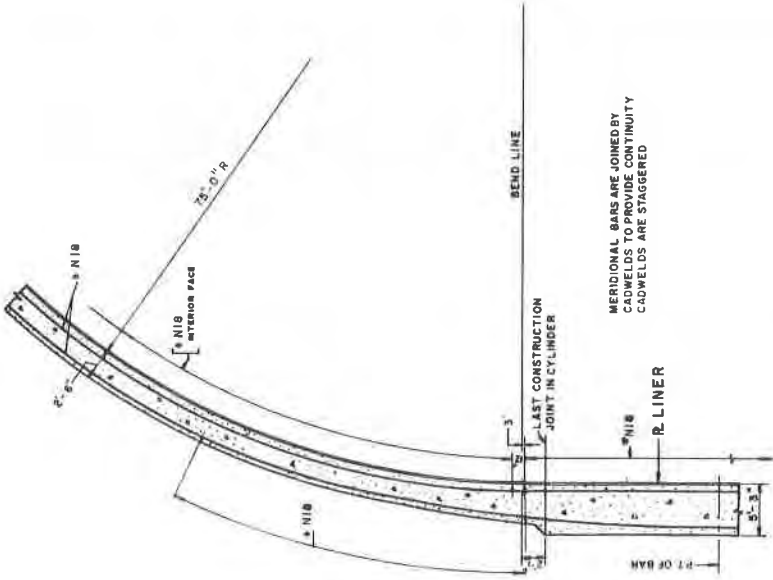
Intersection of Cylindrical Shell and Dome
